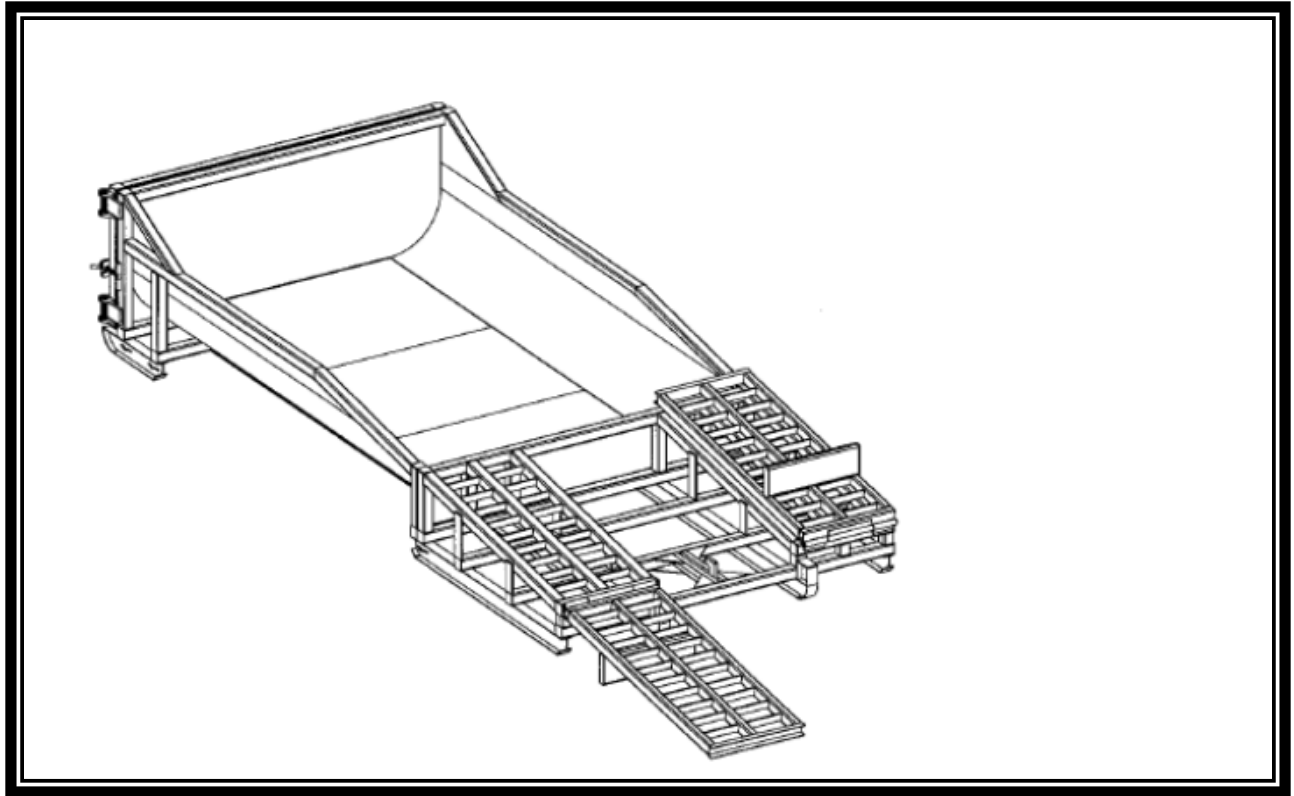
Prefabricated Concrete Washout Container w/Ramp
